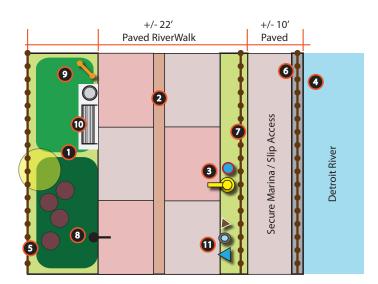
Riverfront Extension at Marina Edge Plan-Section: Full Level of Development
